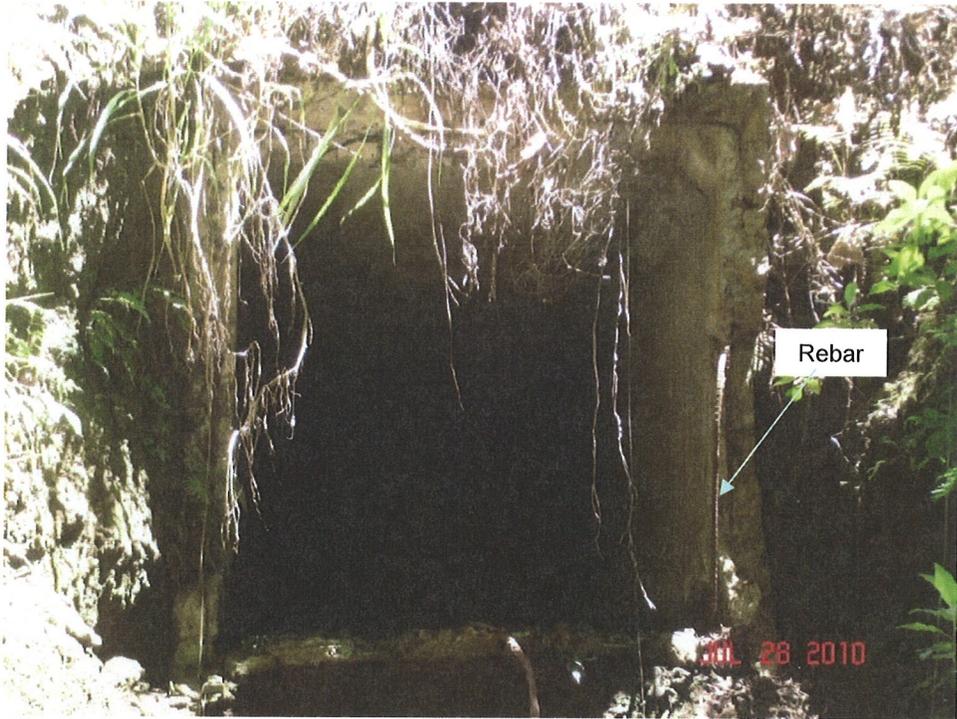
Concrete box culvert in eroded embankment, facing south.
